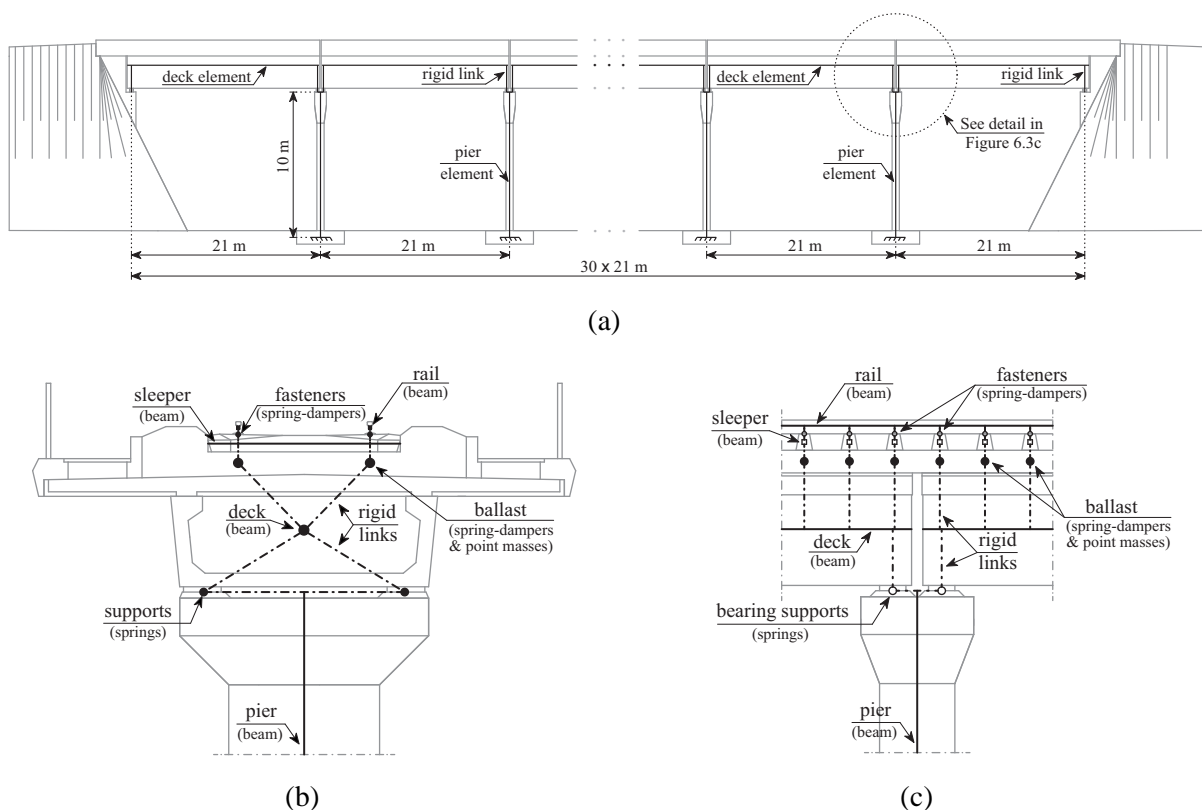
Numerical model of the viaduct: (a) elevation view, (b) cross-section and (c) deck joint.
